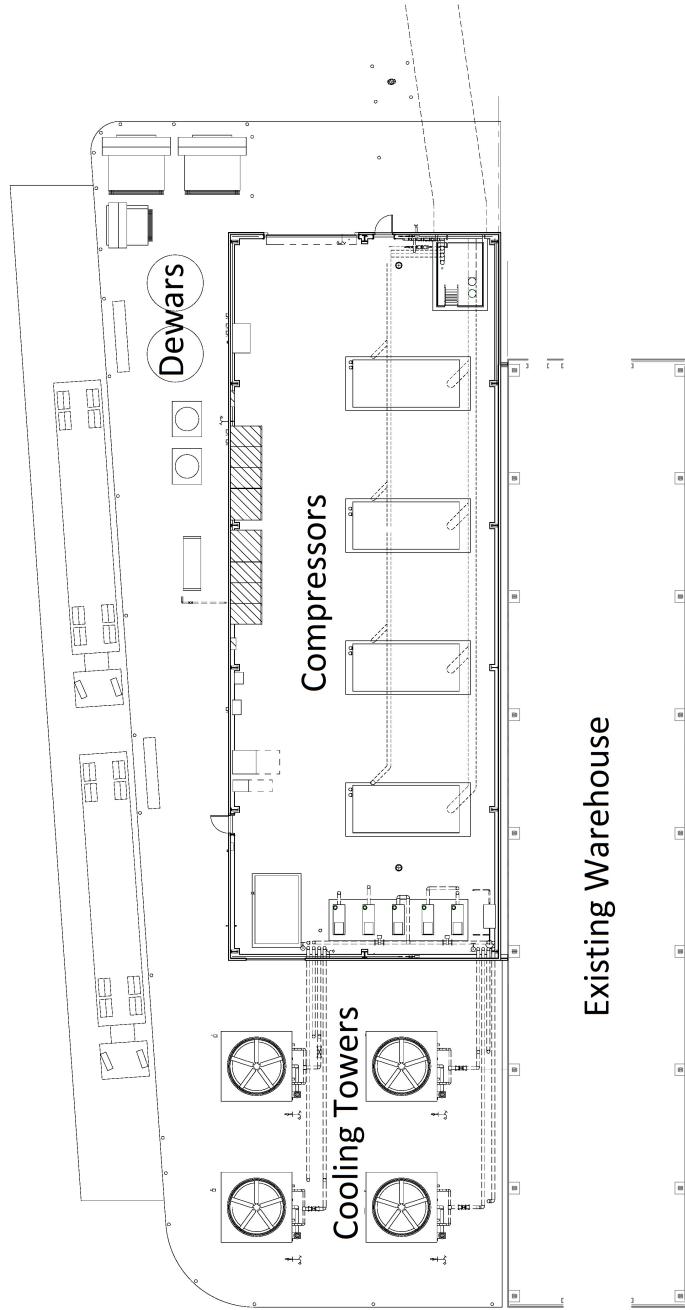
Architectural layout of LBNF Cryogenics Compressor Building
